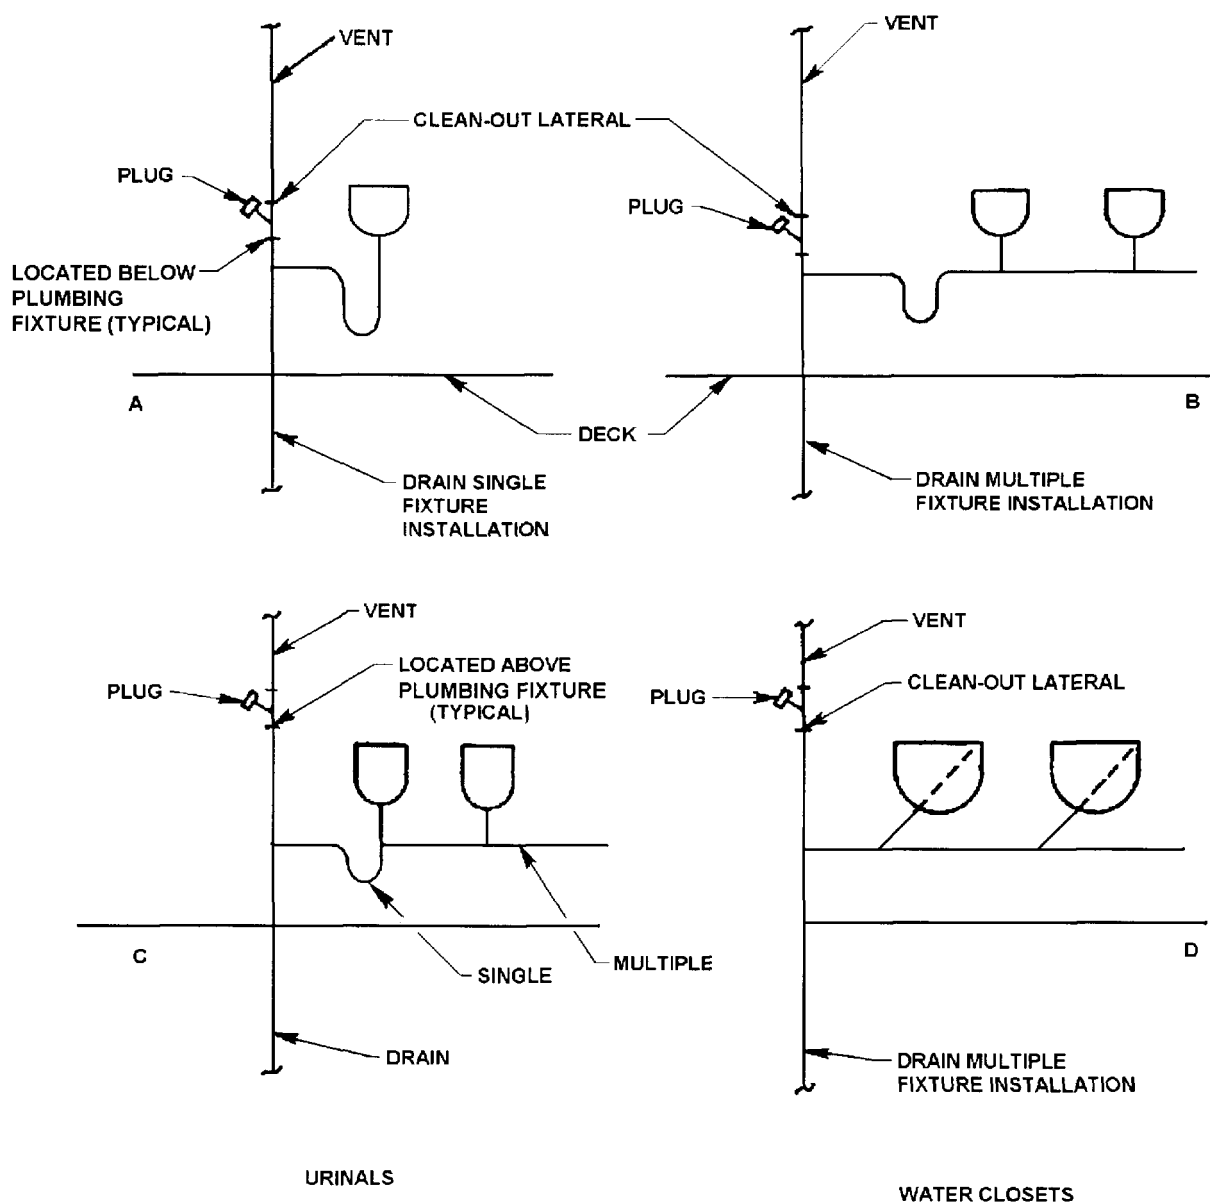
Typical Deck Cleanout Connection Locations (Sheet 1 of 2)
